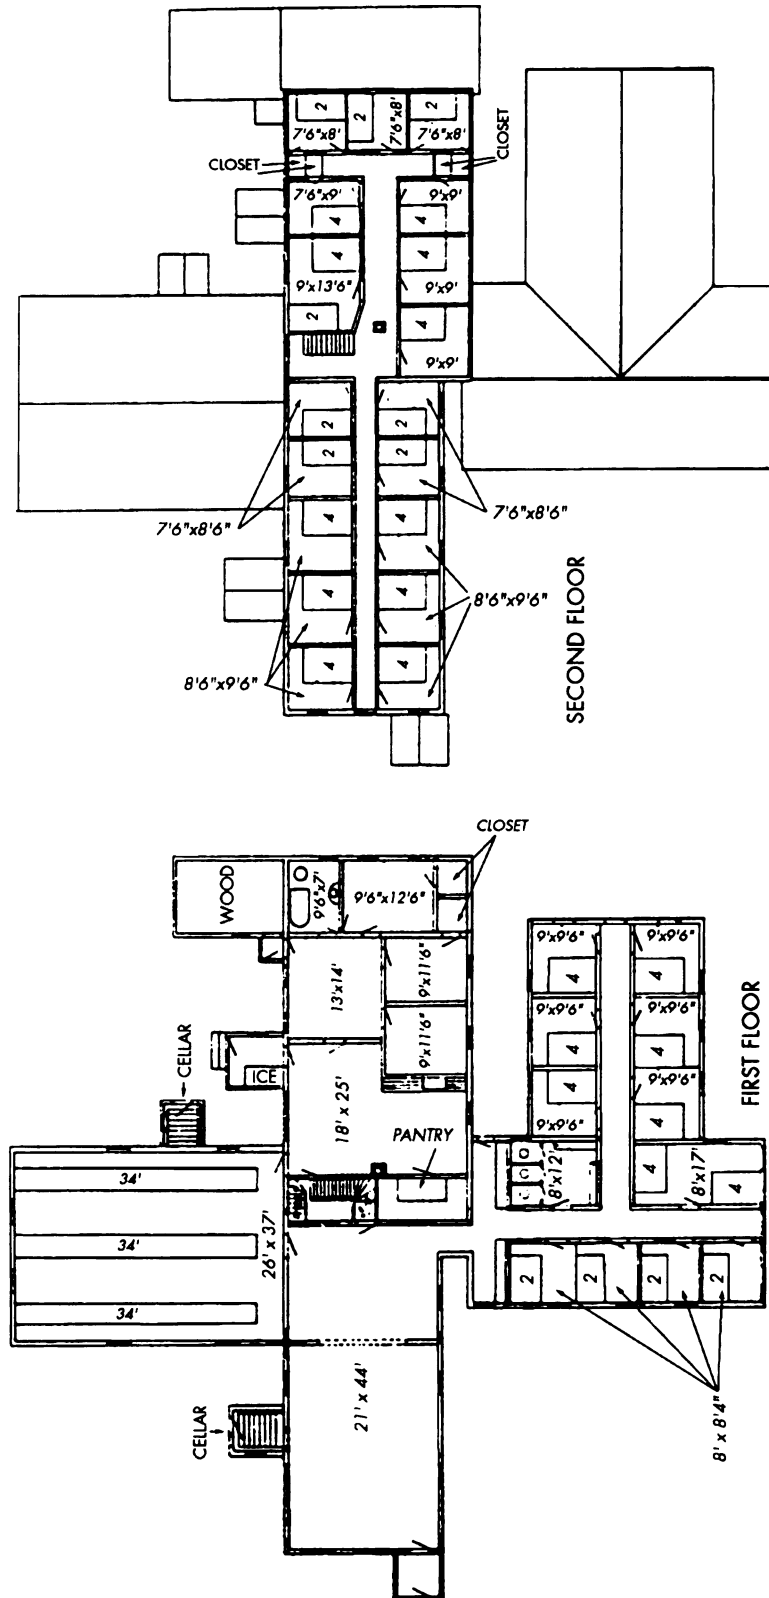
Adapted from Floorplan of Franklin Boardinghouse, 1917. (HAER Mi-2-250)
